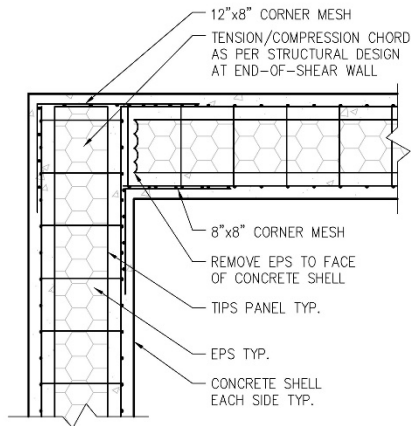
DESIGNATED SHEAR WALL SECTION VIEW
